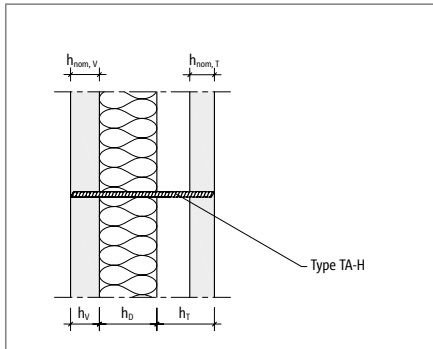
Schöck Isolink® type TA-H: Cross-section details for the element wall  $h_{nom,V} = h_V$
